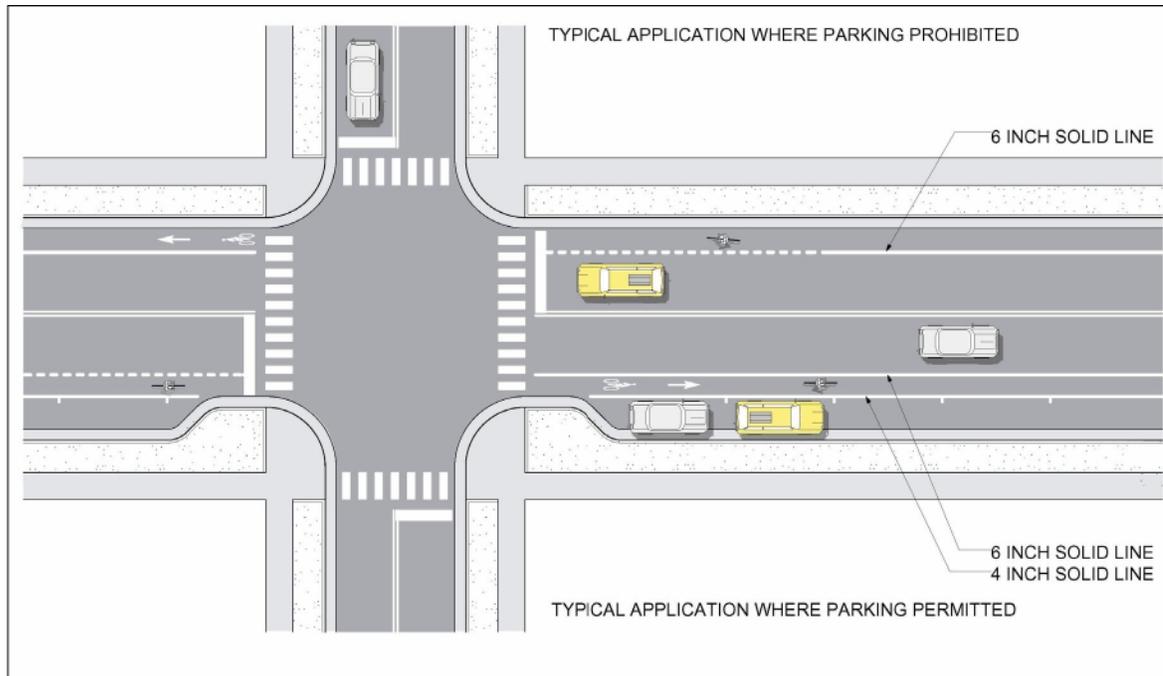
Typical bike lane details on streets with and without on-street parking. Note that the pedestrian bulbs at the intersection do not extend into bike lanes.
